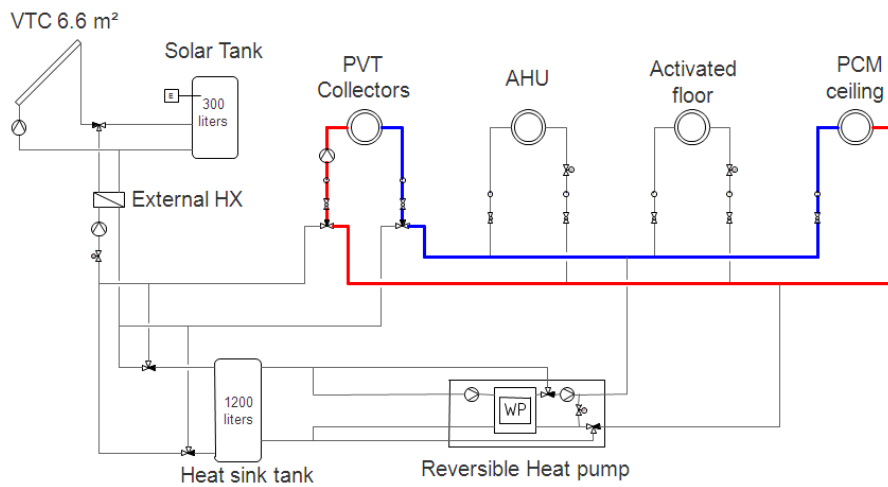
Integration of PVT collectors into the Home+ system technology with vacuum tube collectors and 300 l storage tank for warm water production, PVT collectors, heat sink tank and reversible heat pump, air handling unit AHU, activated floor and PCM ceiling.
